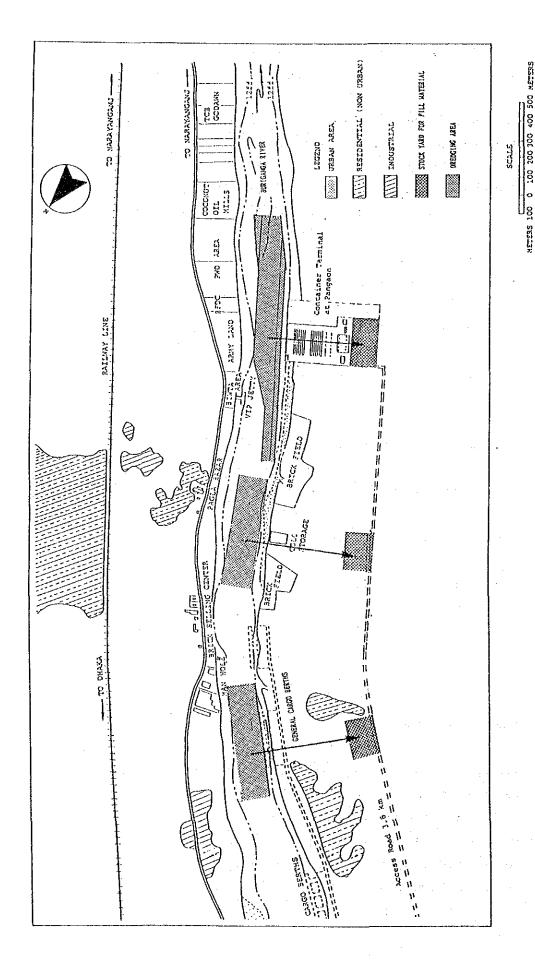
LAND RECLAMATION PLAN AT PANGAON SITE
